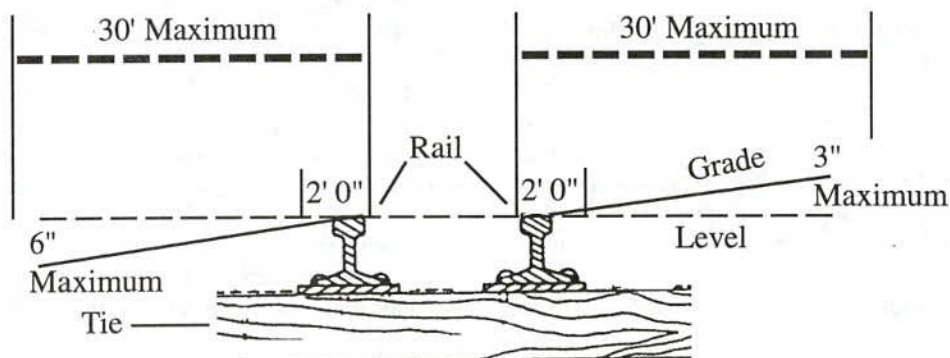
AASHTO design policy for elevation at highway-rail crossings.
